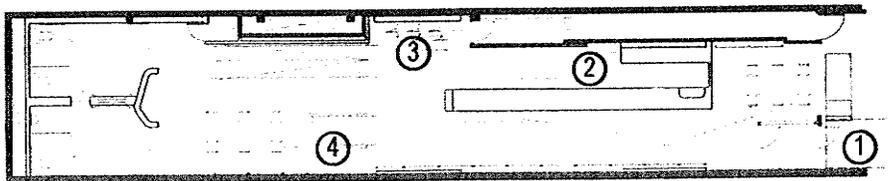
ING Direct Internet Café, New York City. Floor plan: Ground level. Key notes on plan, correspond to the legend at the top of this page. Designed by Gensler, 2000.
